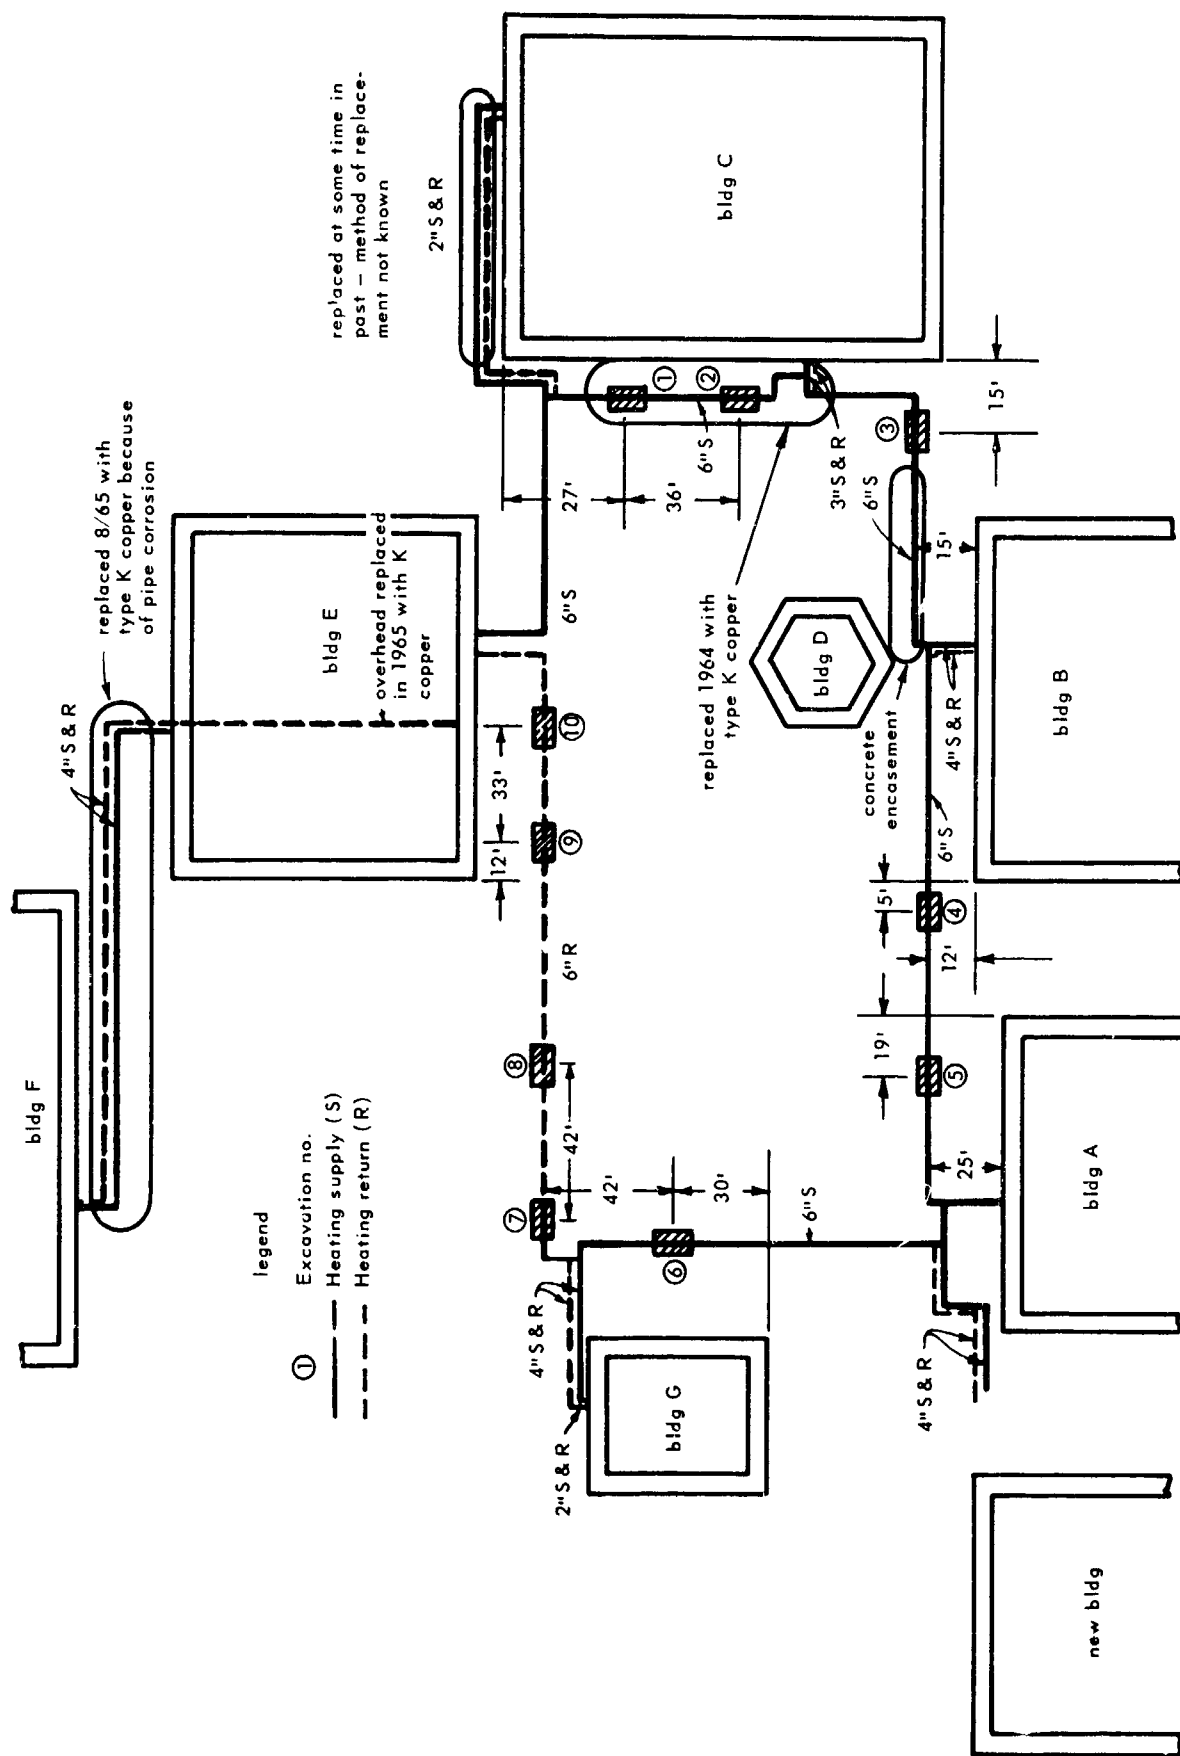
Plan view: location of underground hot water heating system, St. Thomas Aquinas High School, St. Louis, Missouri.
